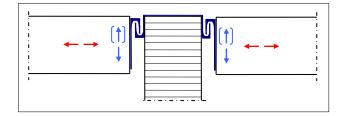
Connection to transfer horizontal and vertical loads, potentially enabling detachment in case of failure
